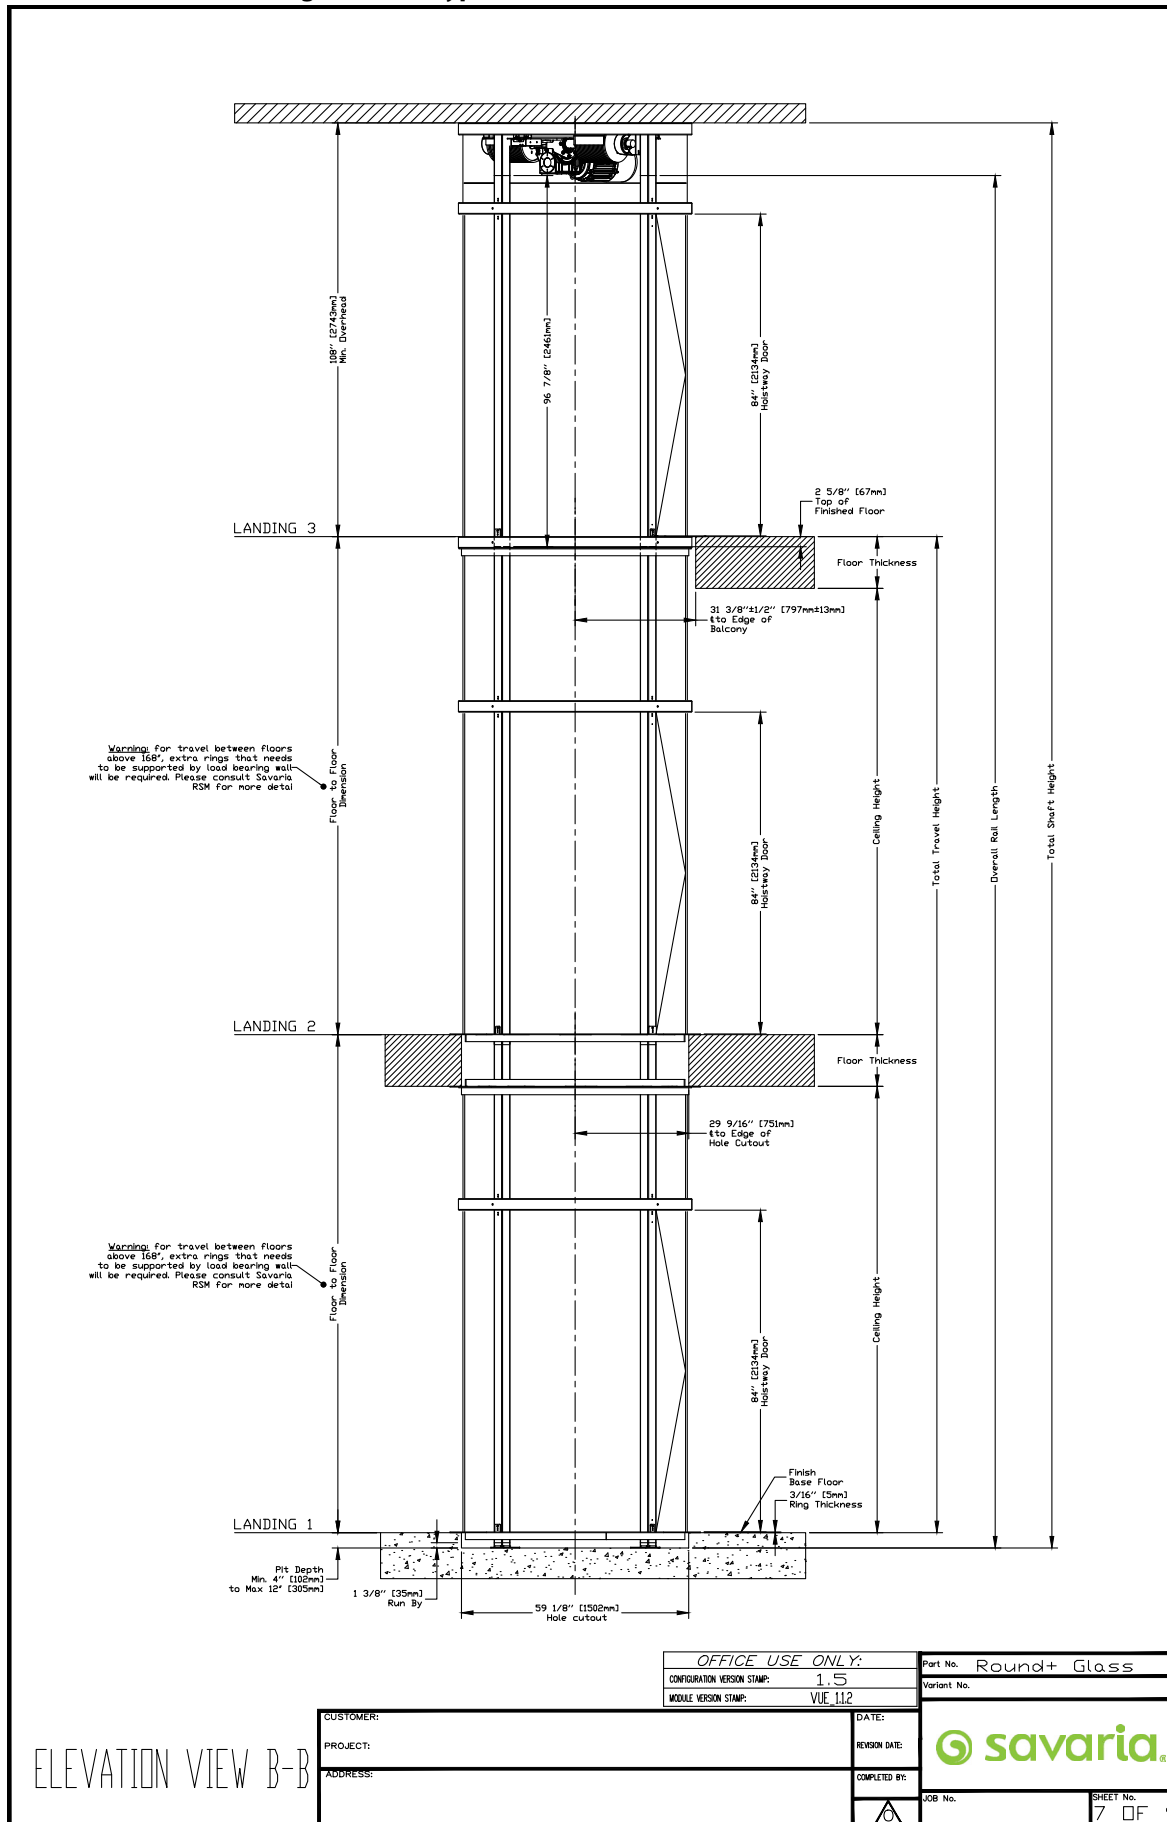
Elevation view - round+ glass (RGL) type 1, 2 or 3
